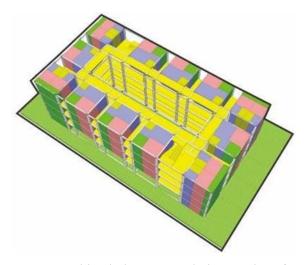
Rusunawa rancacili building, each building consists of various units.
